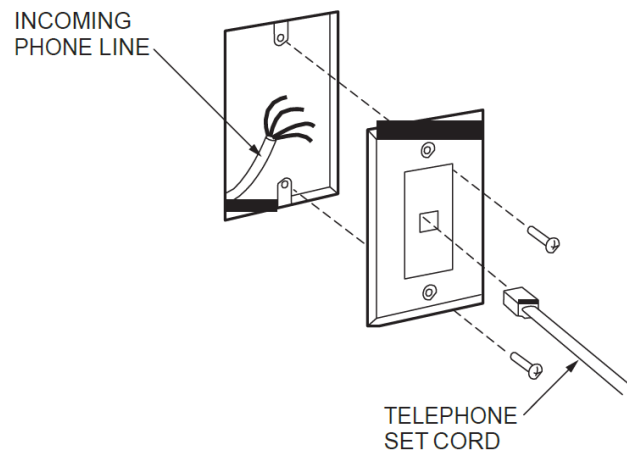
■ Terminating a Modular, Flush-Mounted Telephone Wall Outlet
